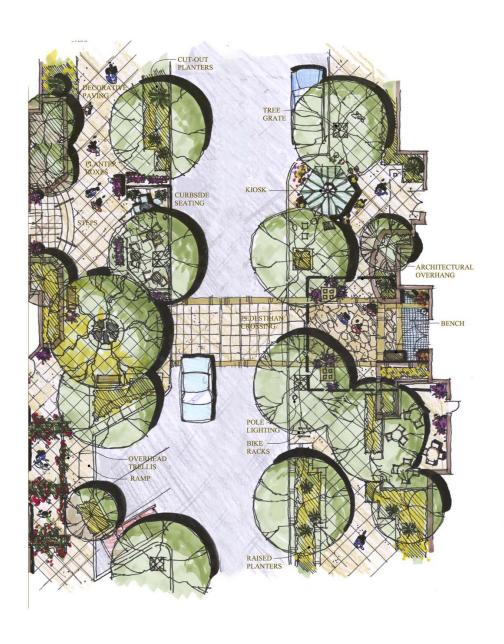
Typical Walkway and Sidewalk Conditions Diagram
